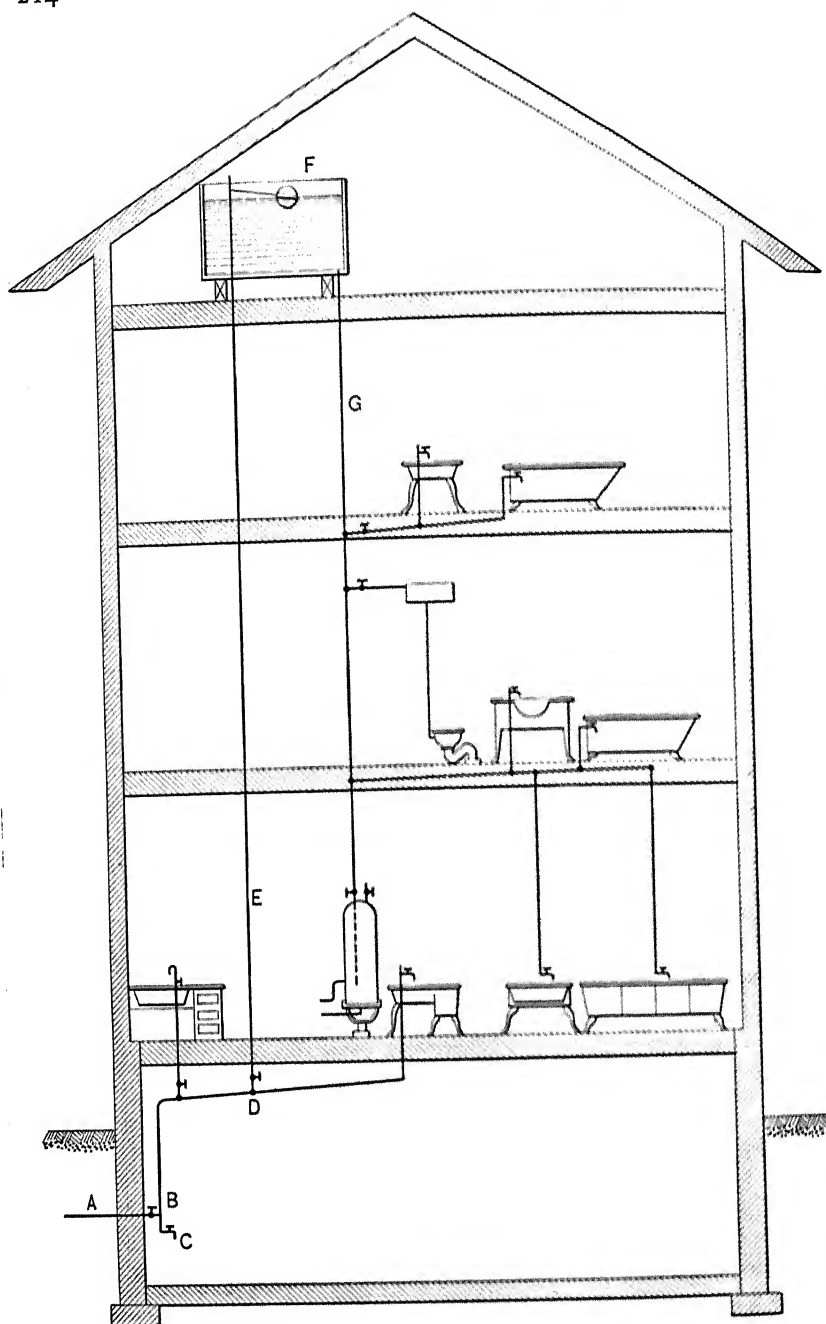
Section Showing Water Supply of House from Tank Pressure.
